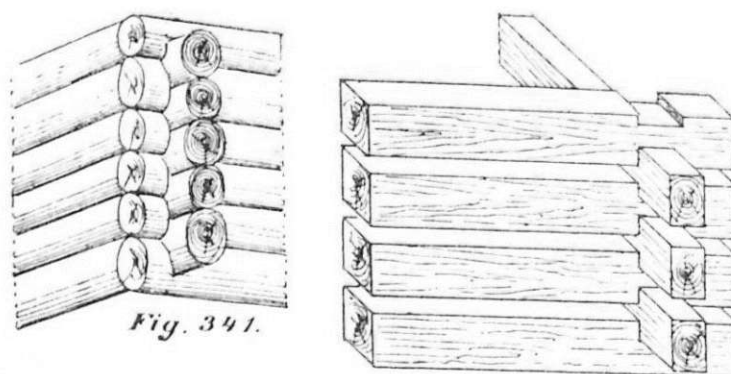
Details of notched log ends on the corner, “Holzbau: Fachwerk-, Block-, Ständer und Stabbau” by H. Issel, 2004, p. 158
